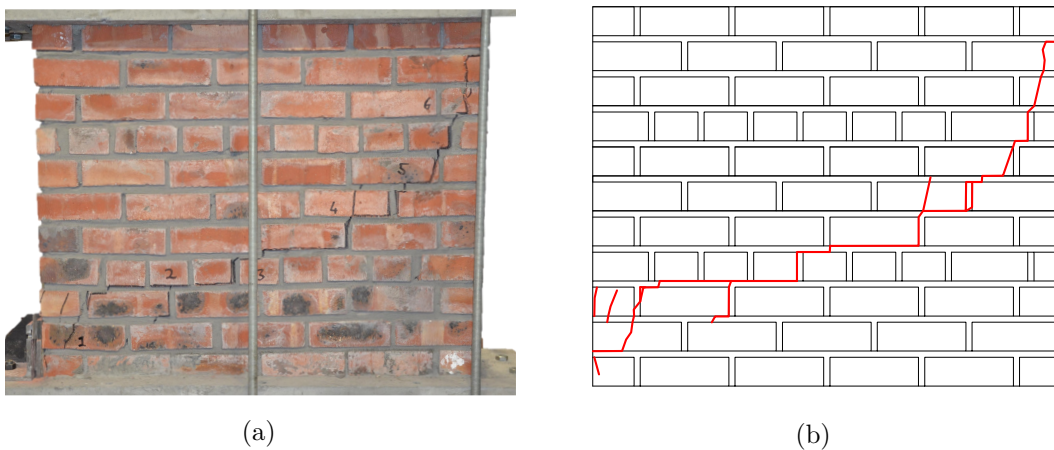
SW-220-0-3 (a) Cracked specimen; (b) Crack pattern documented.
